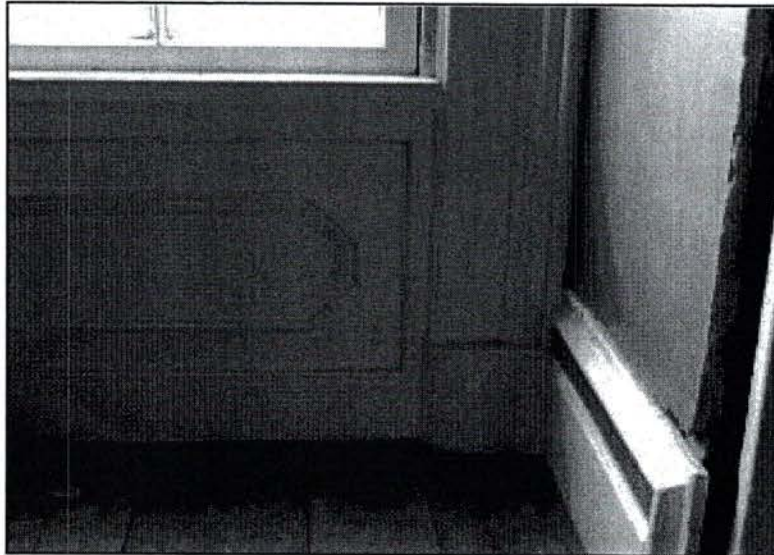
The window skirts in Rooms 102 and 104 have octagonal moldings instead of the oval moldings found in Rooms 100 and 102.
